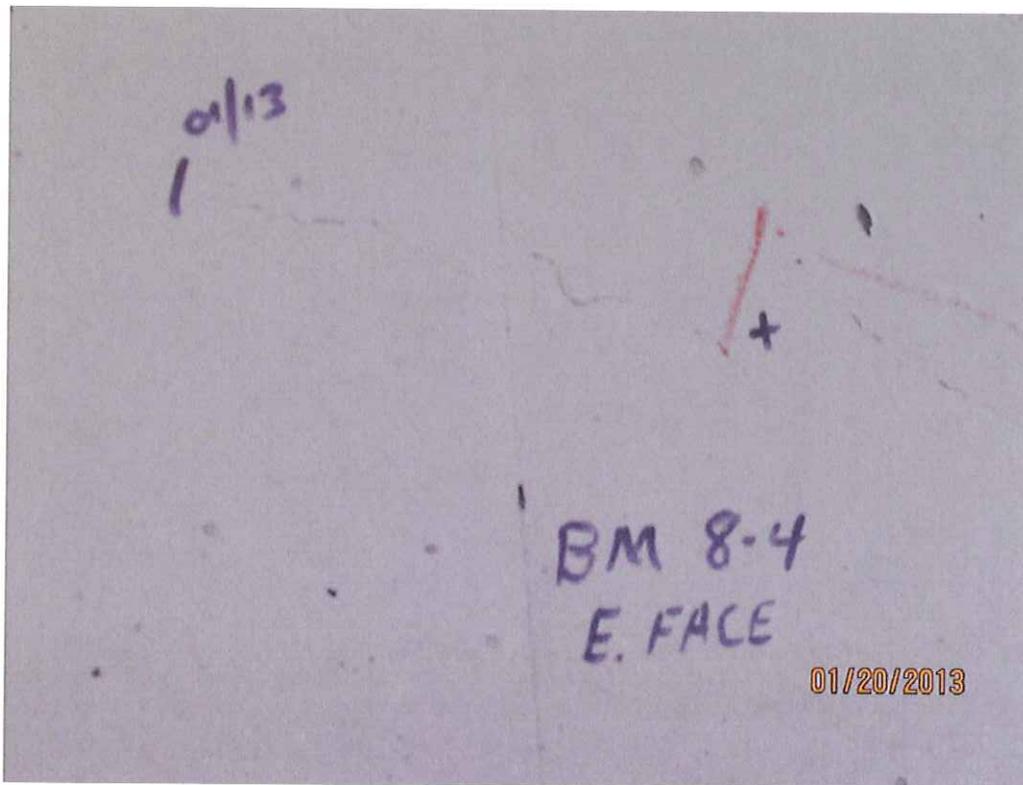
View showing length of crack increase in east face of Beam 8-4
